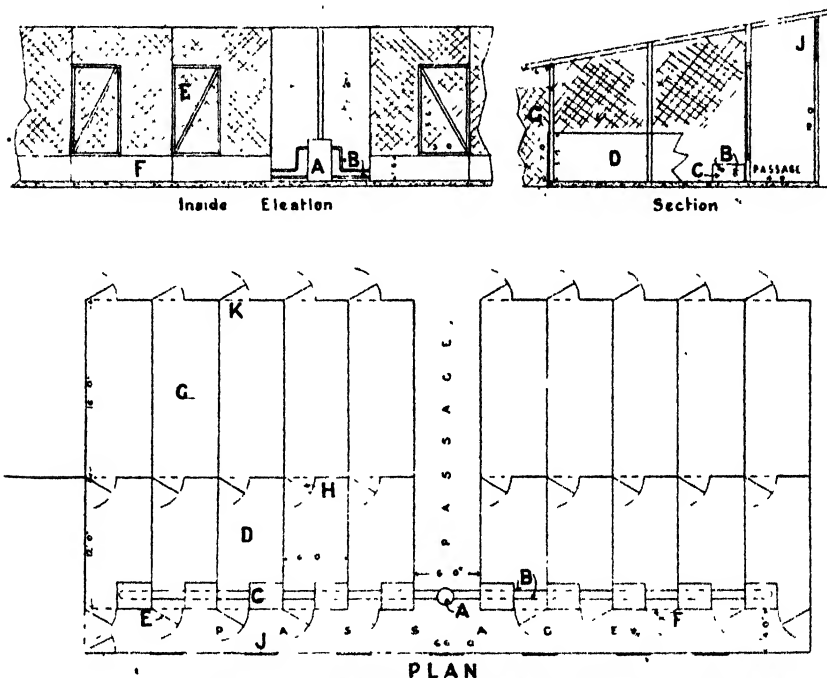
Design of a brooder house arranged for a hot water system. (A) Hot water boiler. (B) Flow and return pipes. (C) Box type brooder covering pipes. (D) Inside runs. (E) Wire gates swinging into passage. (F) Asbestos sheeting 1ft. 6in. high. (G) Outside runs. (H) Gates leading to outside runs. (J) Louvre type windows. (K) Gates to outside runs.
